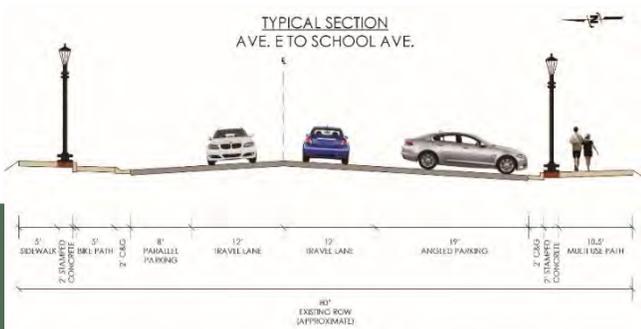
Possible Typical Section for 4th Street from Avenue E to School Avenue – larger version can be found in Appendix A
